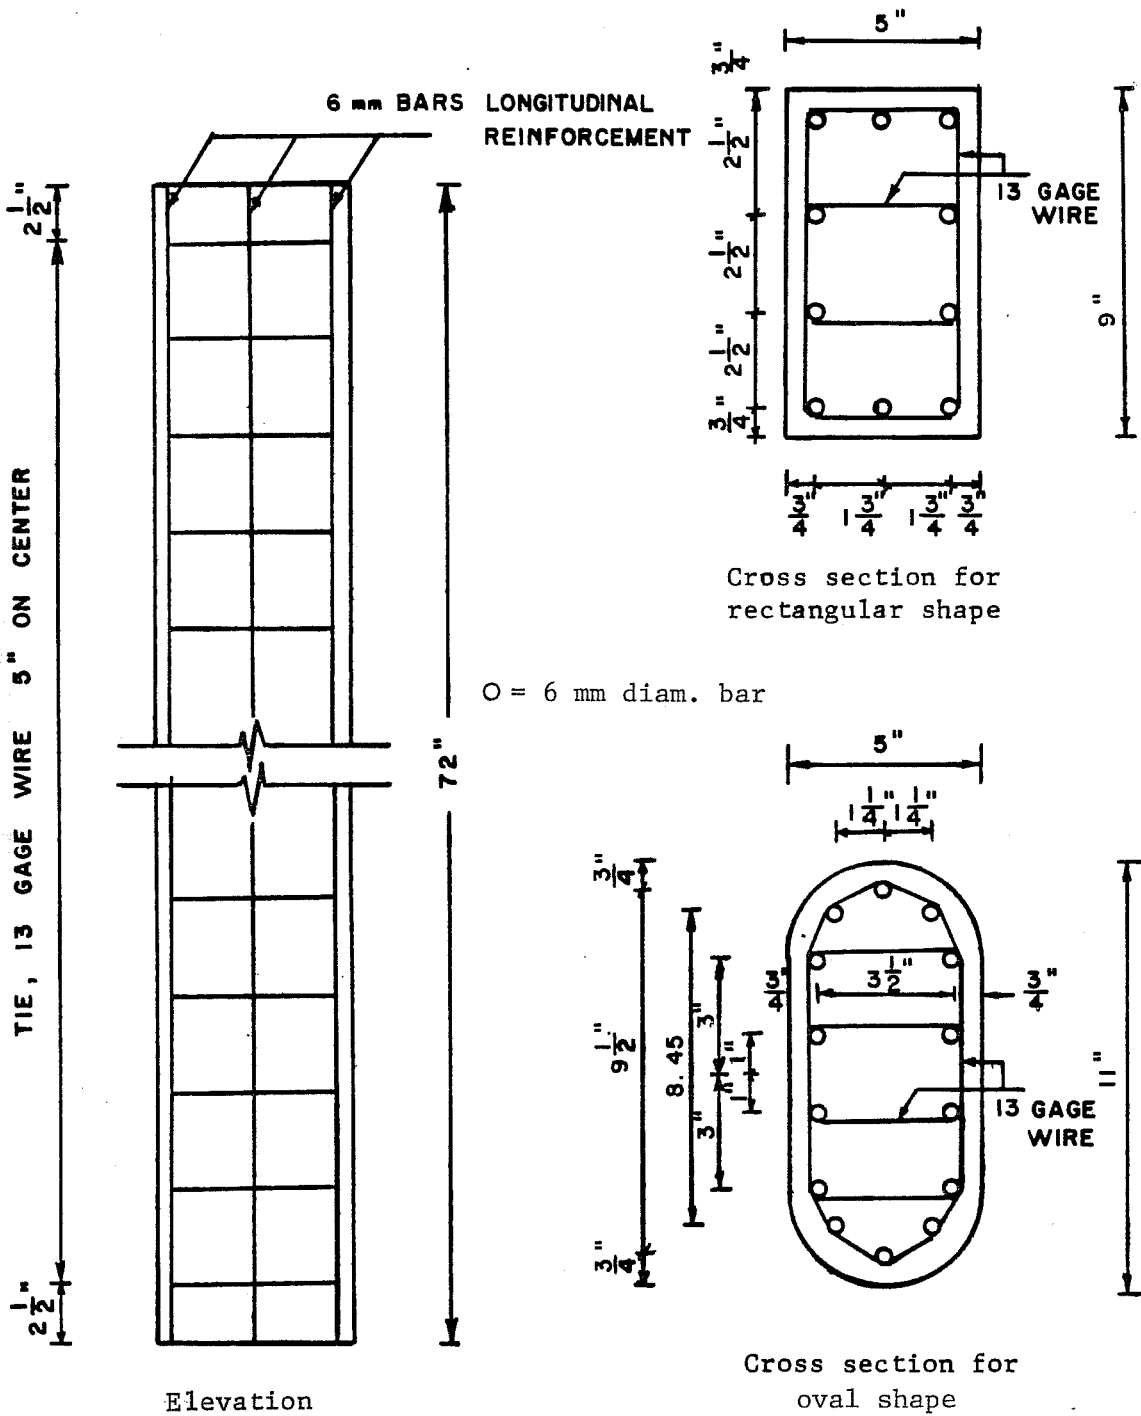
Details of Mavichak's model bridge pier specimens
